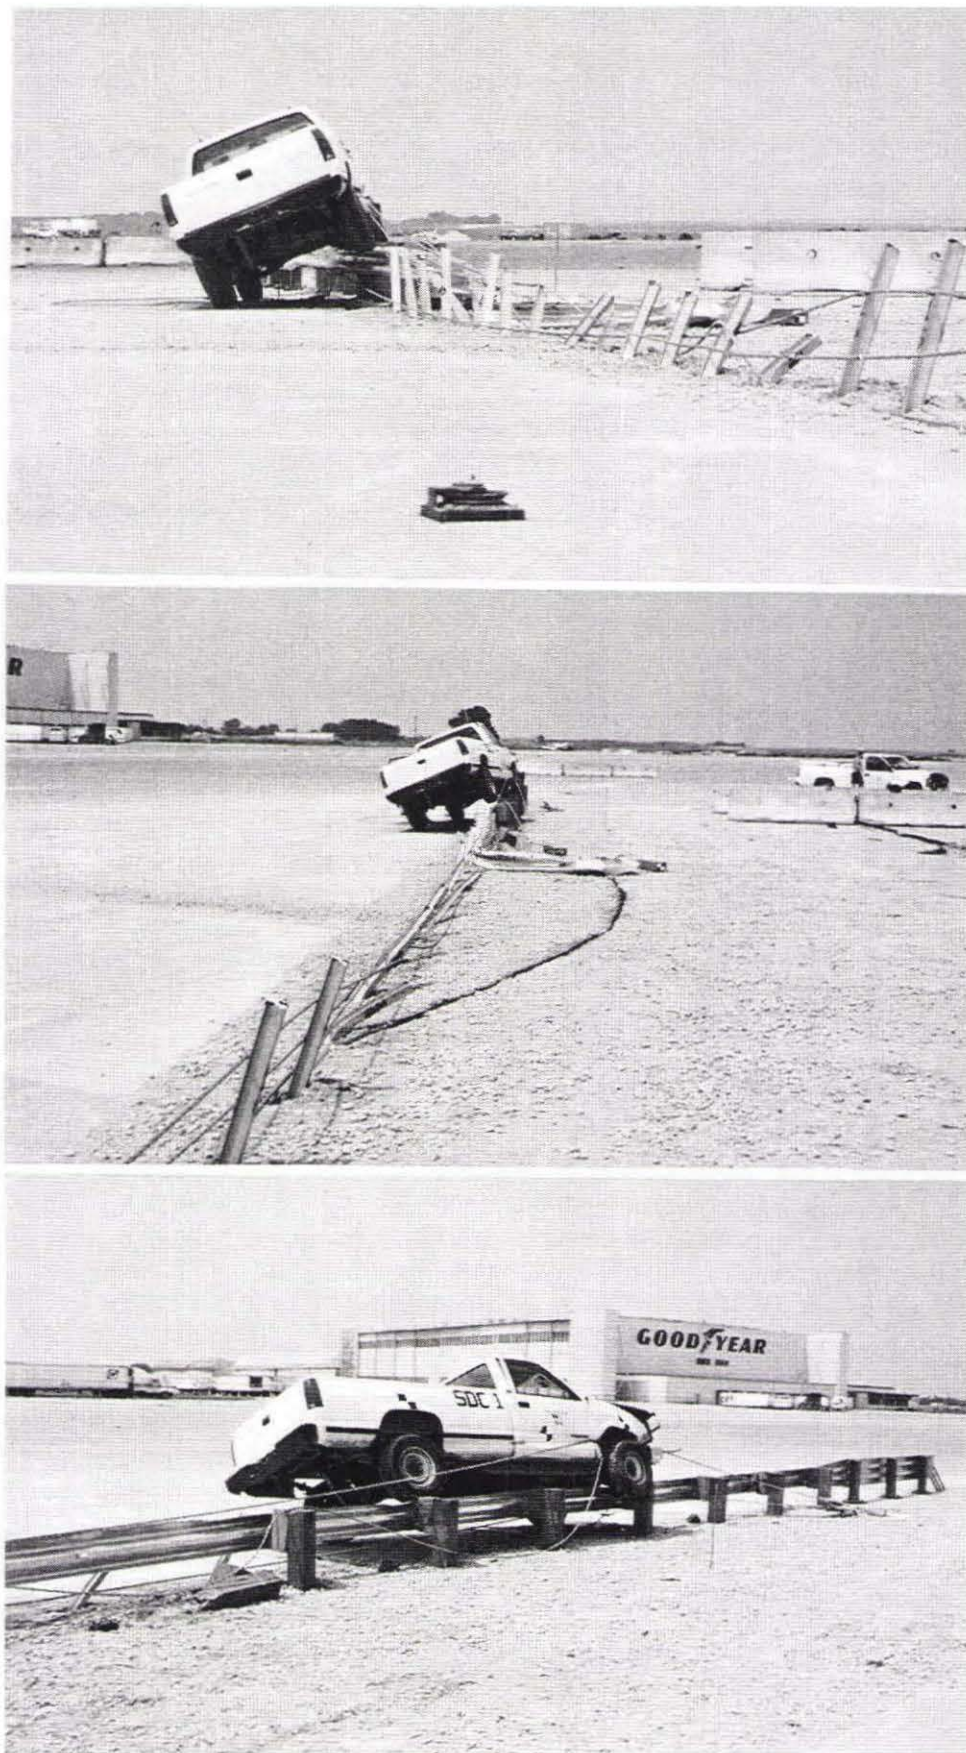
Cable Guardrail to W-Beam Transition Damage, Test SDC-1
